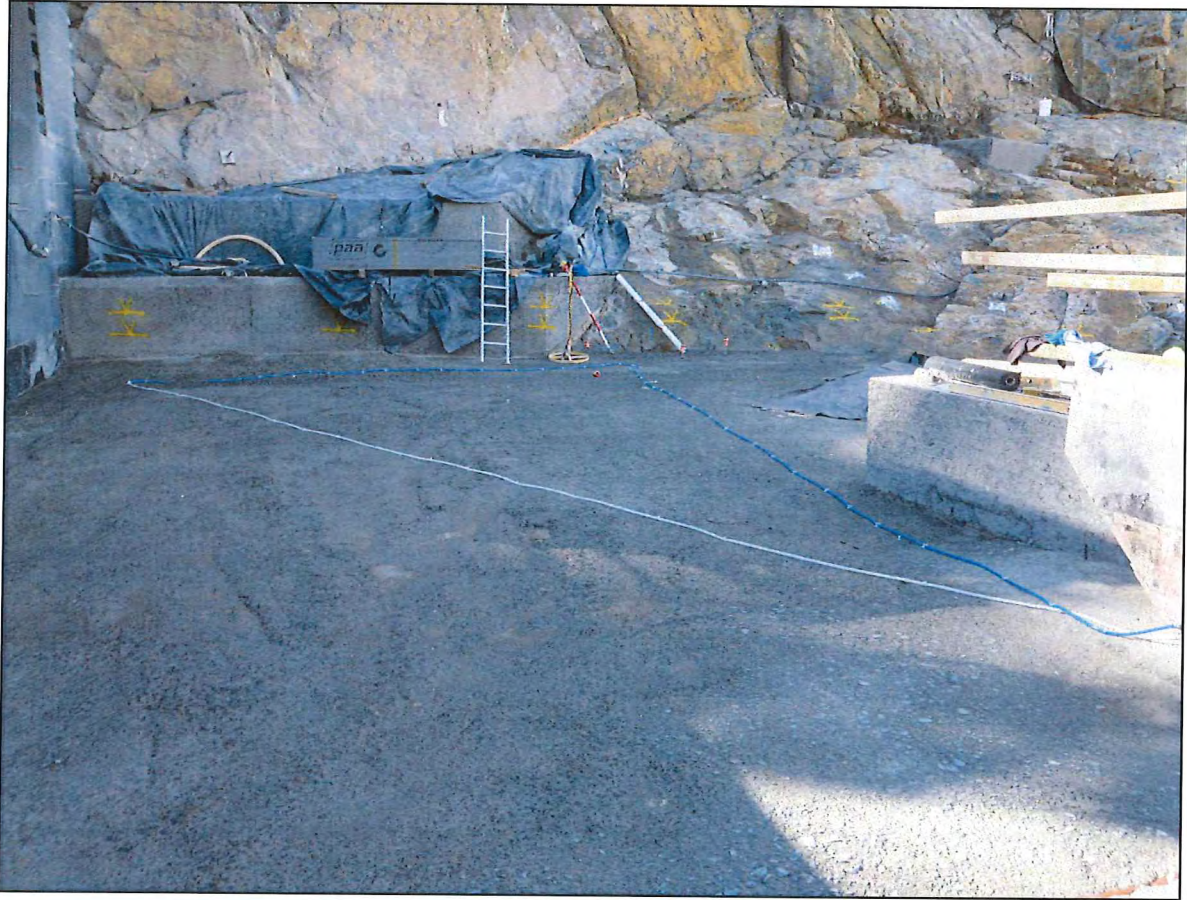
TAMs injection and non-injection grout tubes installed on transverse crack on upstream left abutment.
